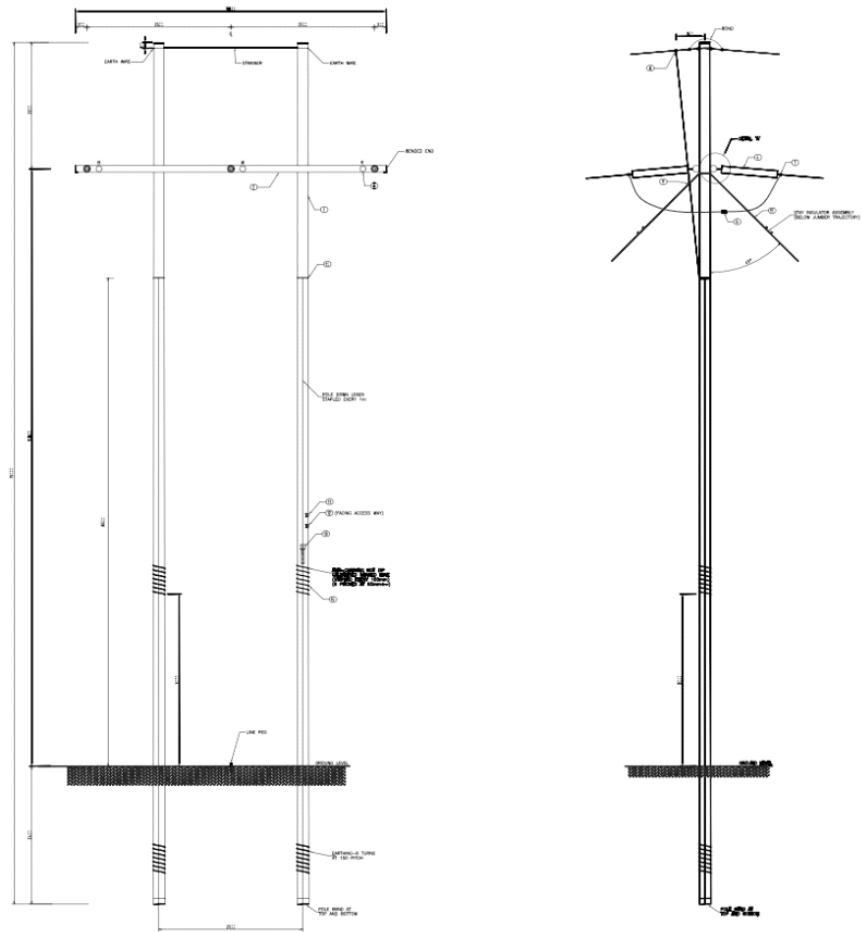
Typical front and side elevations of the 66 kV transmission line towers consisting of wooden poles.
